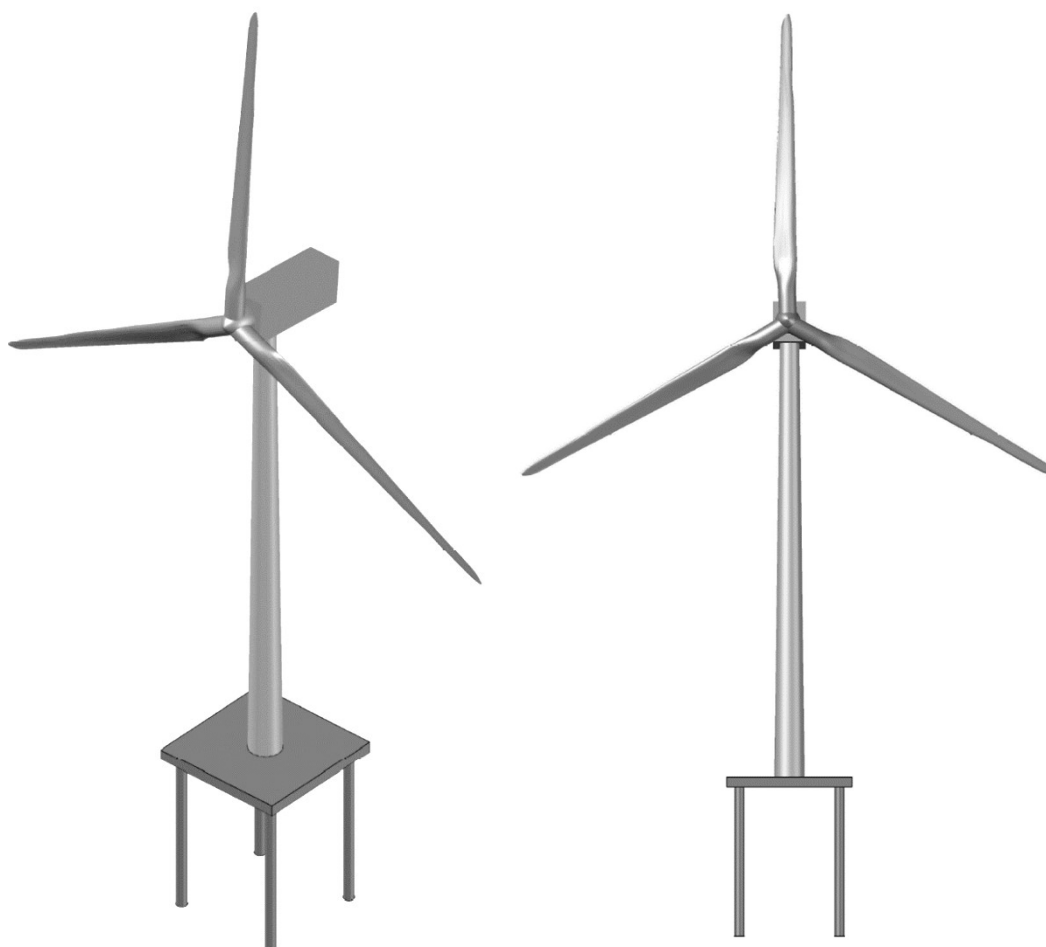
5 MW three-bladed HAWT with a steel column, resting on a concrete pile-supported square footing.
